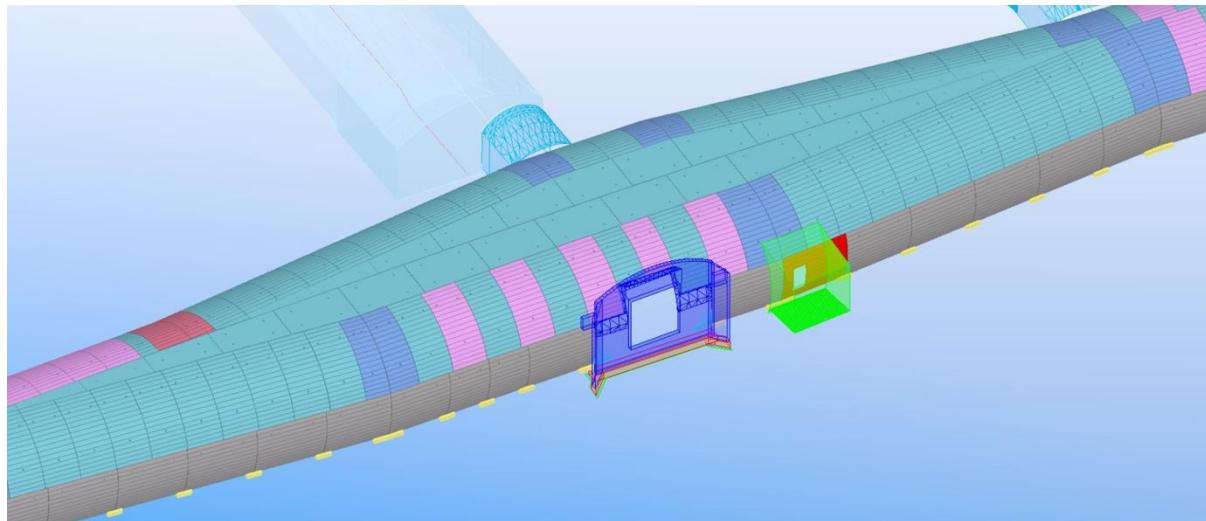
Precast element layout by Spenncon, Hamang tunnel, Norway
